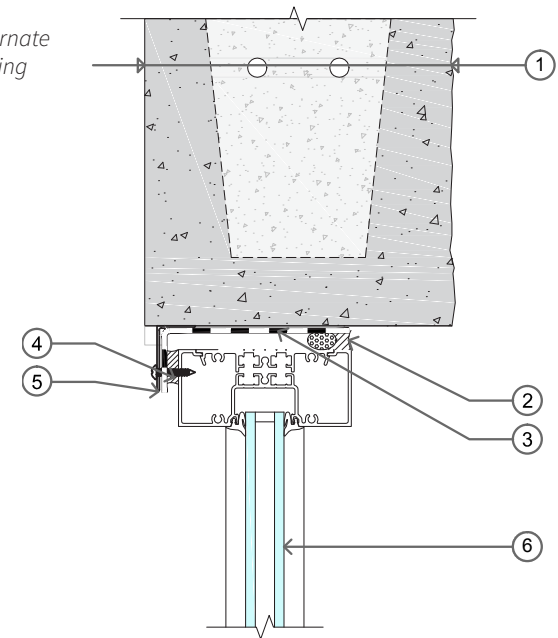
Assembly 4 alternate sheet-metal head flashing
